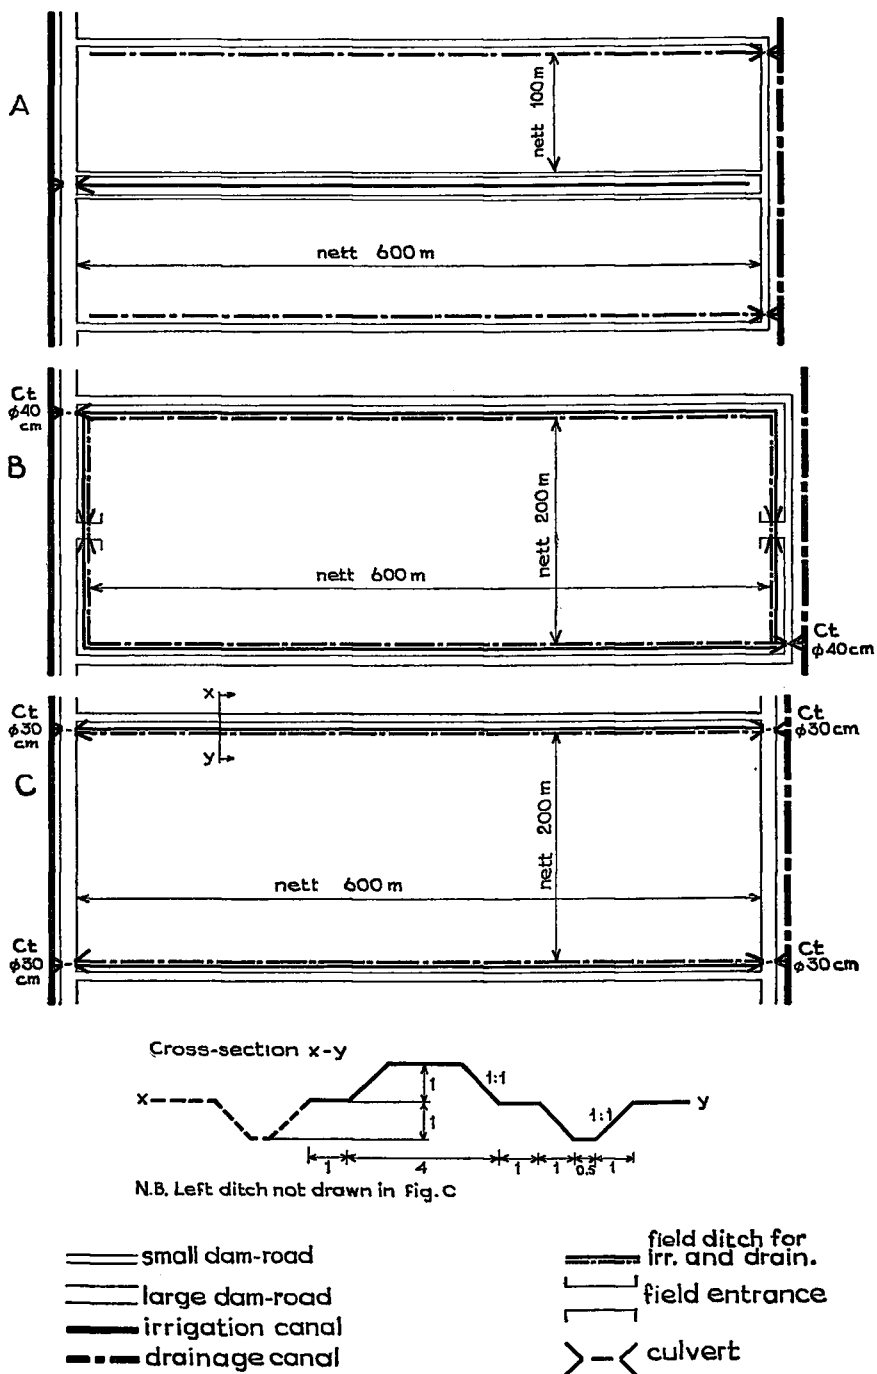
Field lay-out. A and B: alternative designs not carried out.
